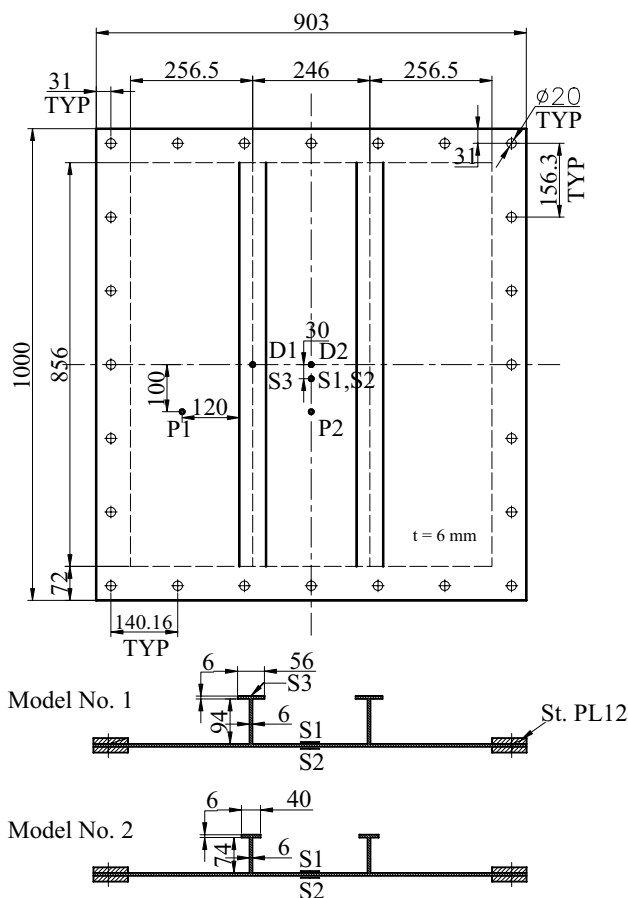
Geometry of the stiffened aluminium plates (unit: mm) [10]
